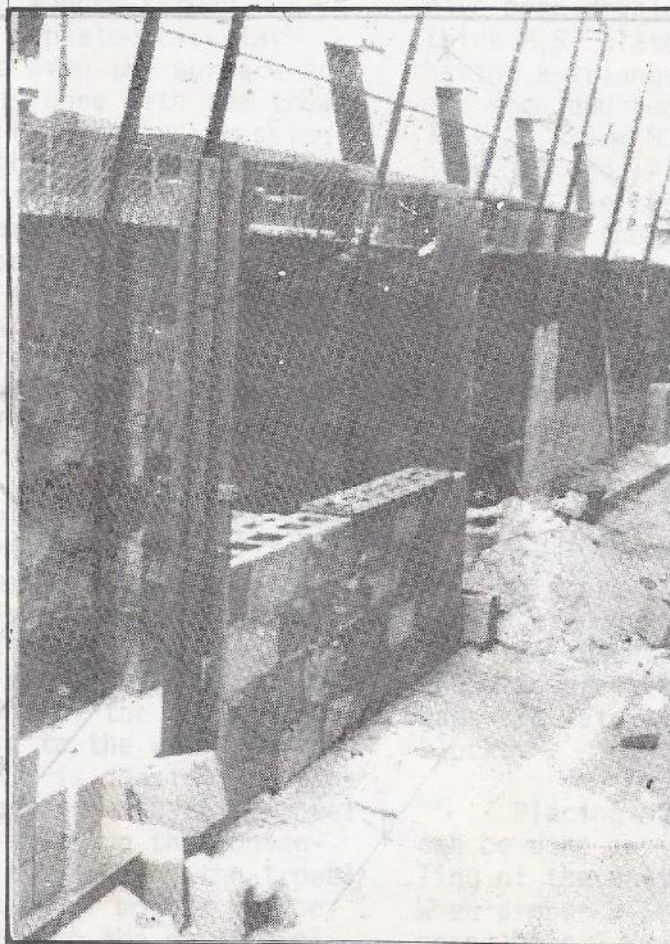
ENDFRAMES AND STRING HOLDERS IN USE
